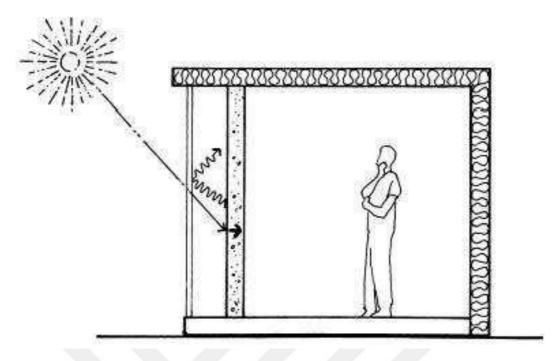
Trombe Wall Storing Solar Heat During Sun-lit Hours
